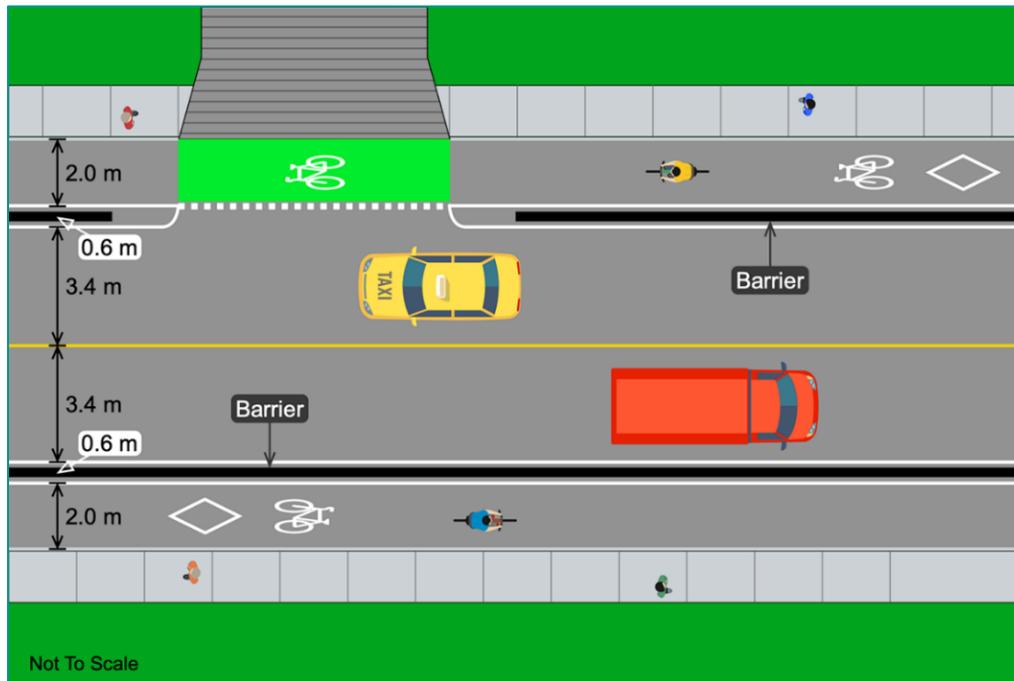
Wallace Street Protected Bicycle Lanes, Typical Cross-Section Fitzwilliam–Franklyn
